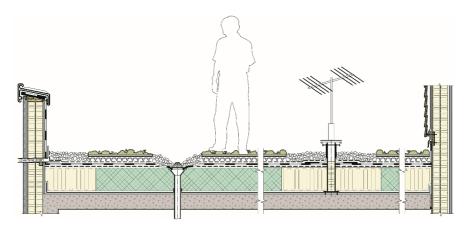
Main design components of a blue-green roof based on a conventional compact roof. From left to right: Parapets, drains, areas of traffic, equipment mounting brackets, and adjoining walls. Note the use of non-flammable insulation and gravel cover where mandated. Illustration: Klima 2050/SINTEF.
